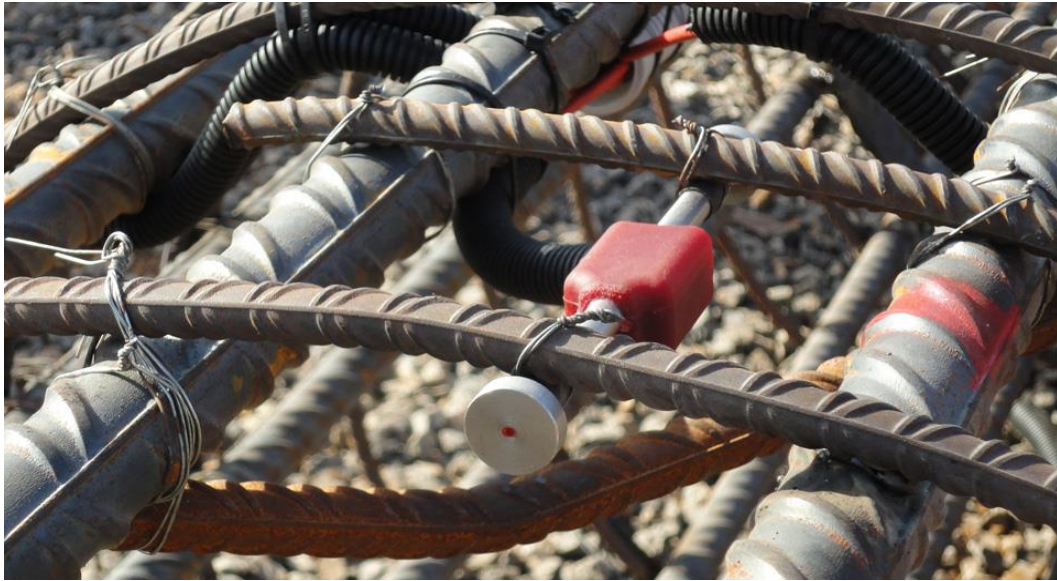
Casting in of wire sensors into a reinforced concrete structure (<http://www.sisgeo.com>)
